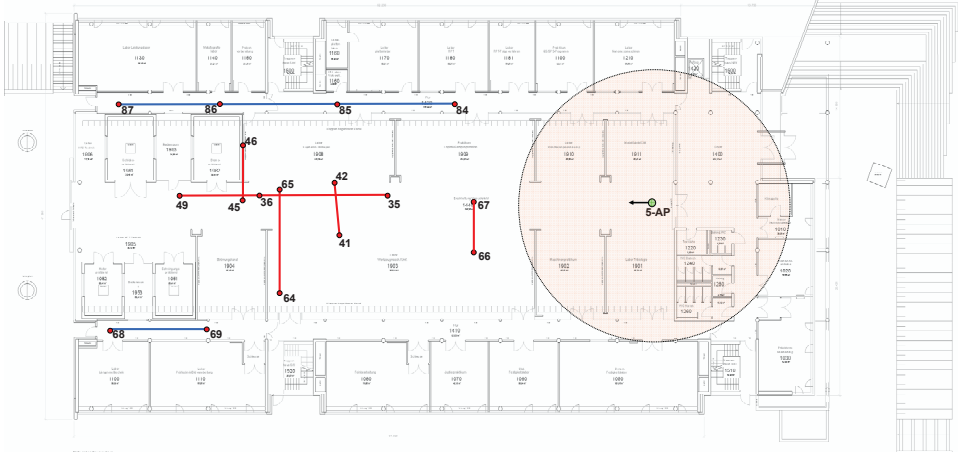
Measurements routes in Newton building: red – ground floor, blue – balcony at the first floor level.
